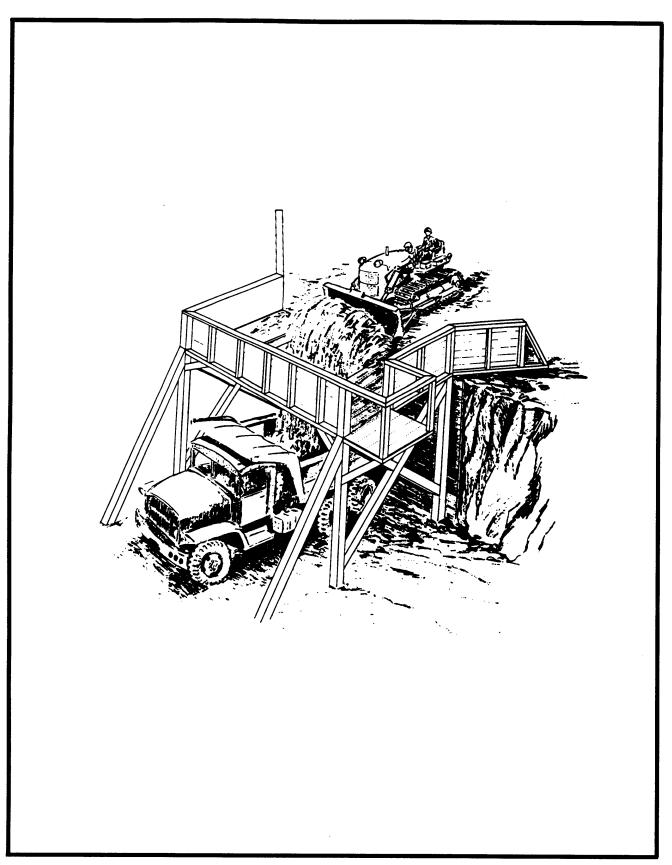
Single-End Trap, Truck-Back-In Loading Ramp
